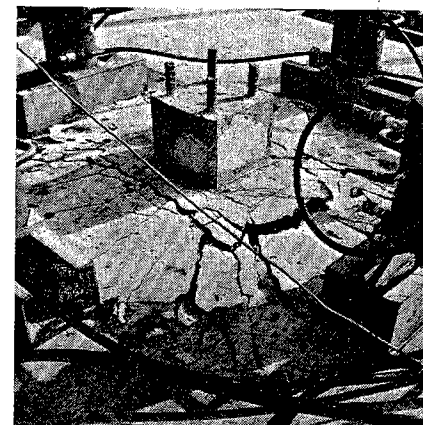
Specimen L-8 at 184 kip (83,600 kgf) load, after primary failure load had occurred—maximum post-failure reserve load was 242 kips (110,000 kgf)
